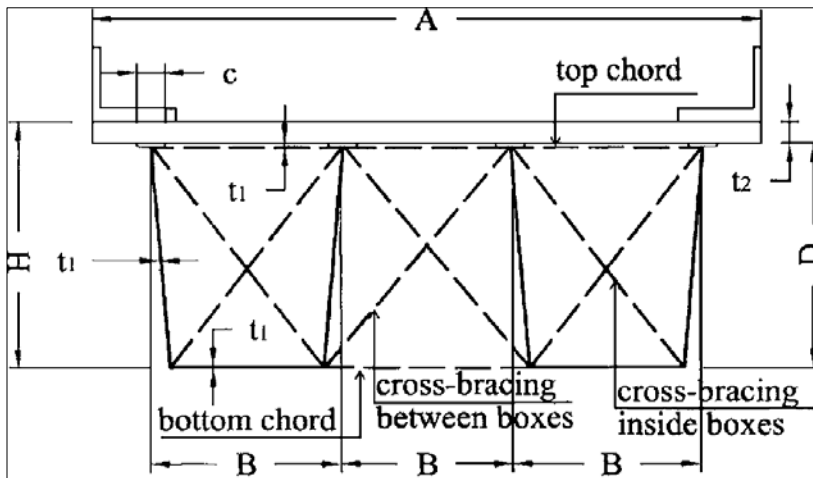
Typical Cross Section (after Samaan et al, 2005)
